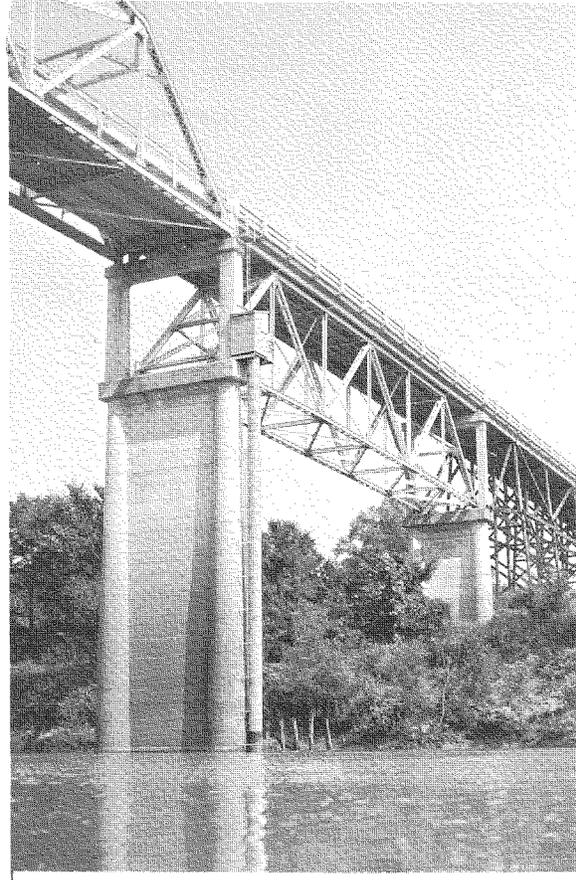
Corrugated-steel-pipe well and wooden shelter attached to bridge pier.
